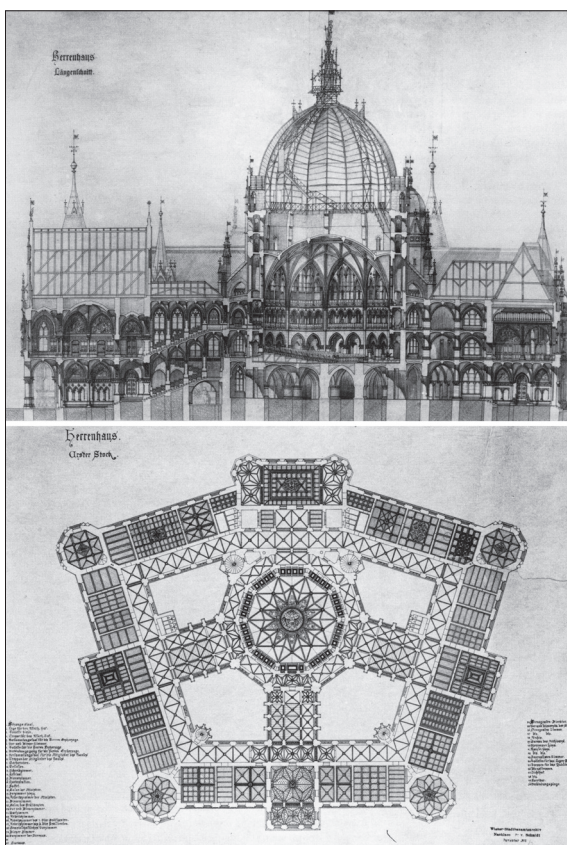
Friedrich Schmidt, Design for the House of Lords in Vienna, 1865, section and ground plan
